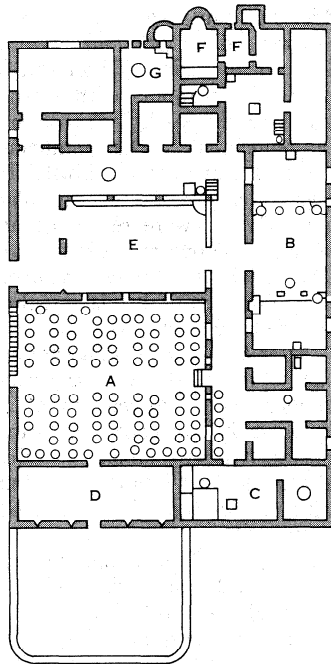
PLAN OF GREEK HOUSE, DELOS
